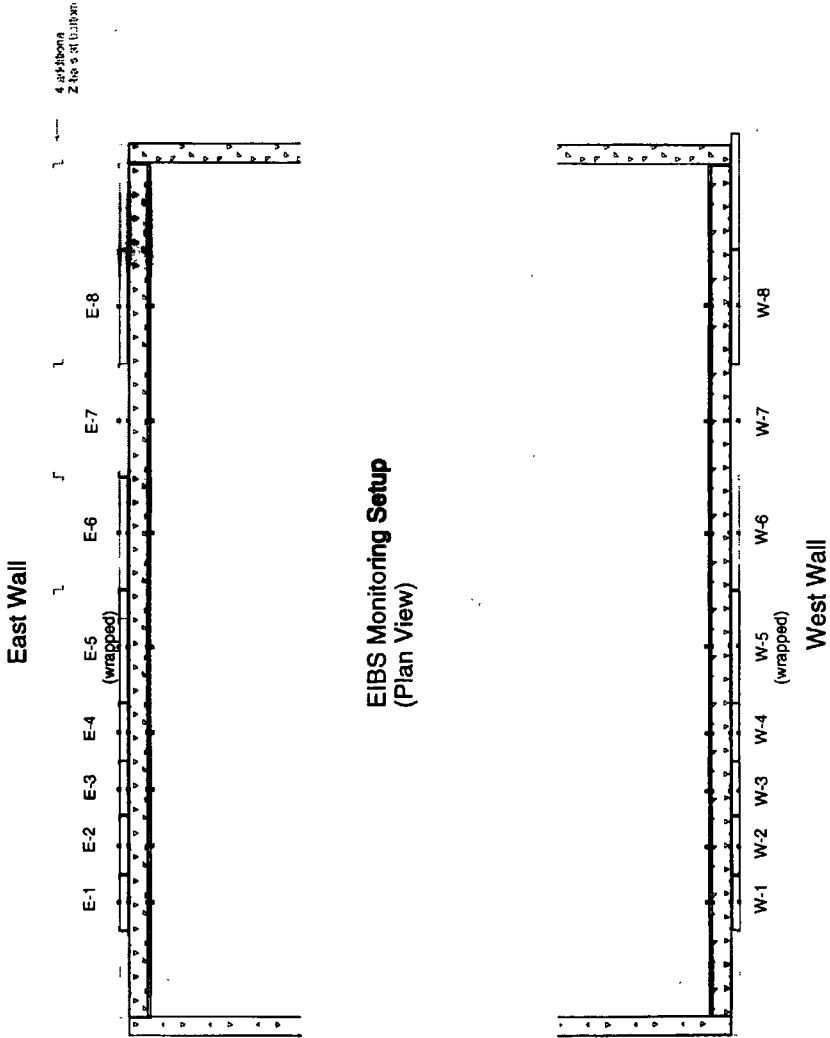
Plan view of the EIBS test setup—east and west walls of the test hut.
